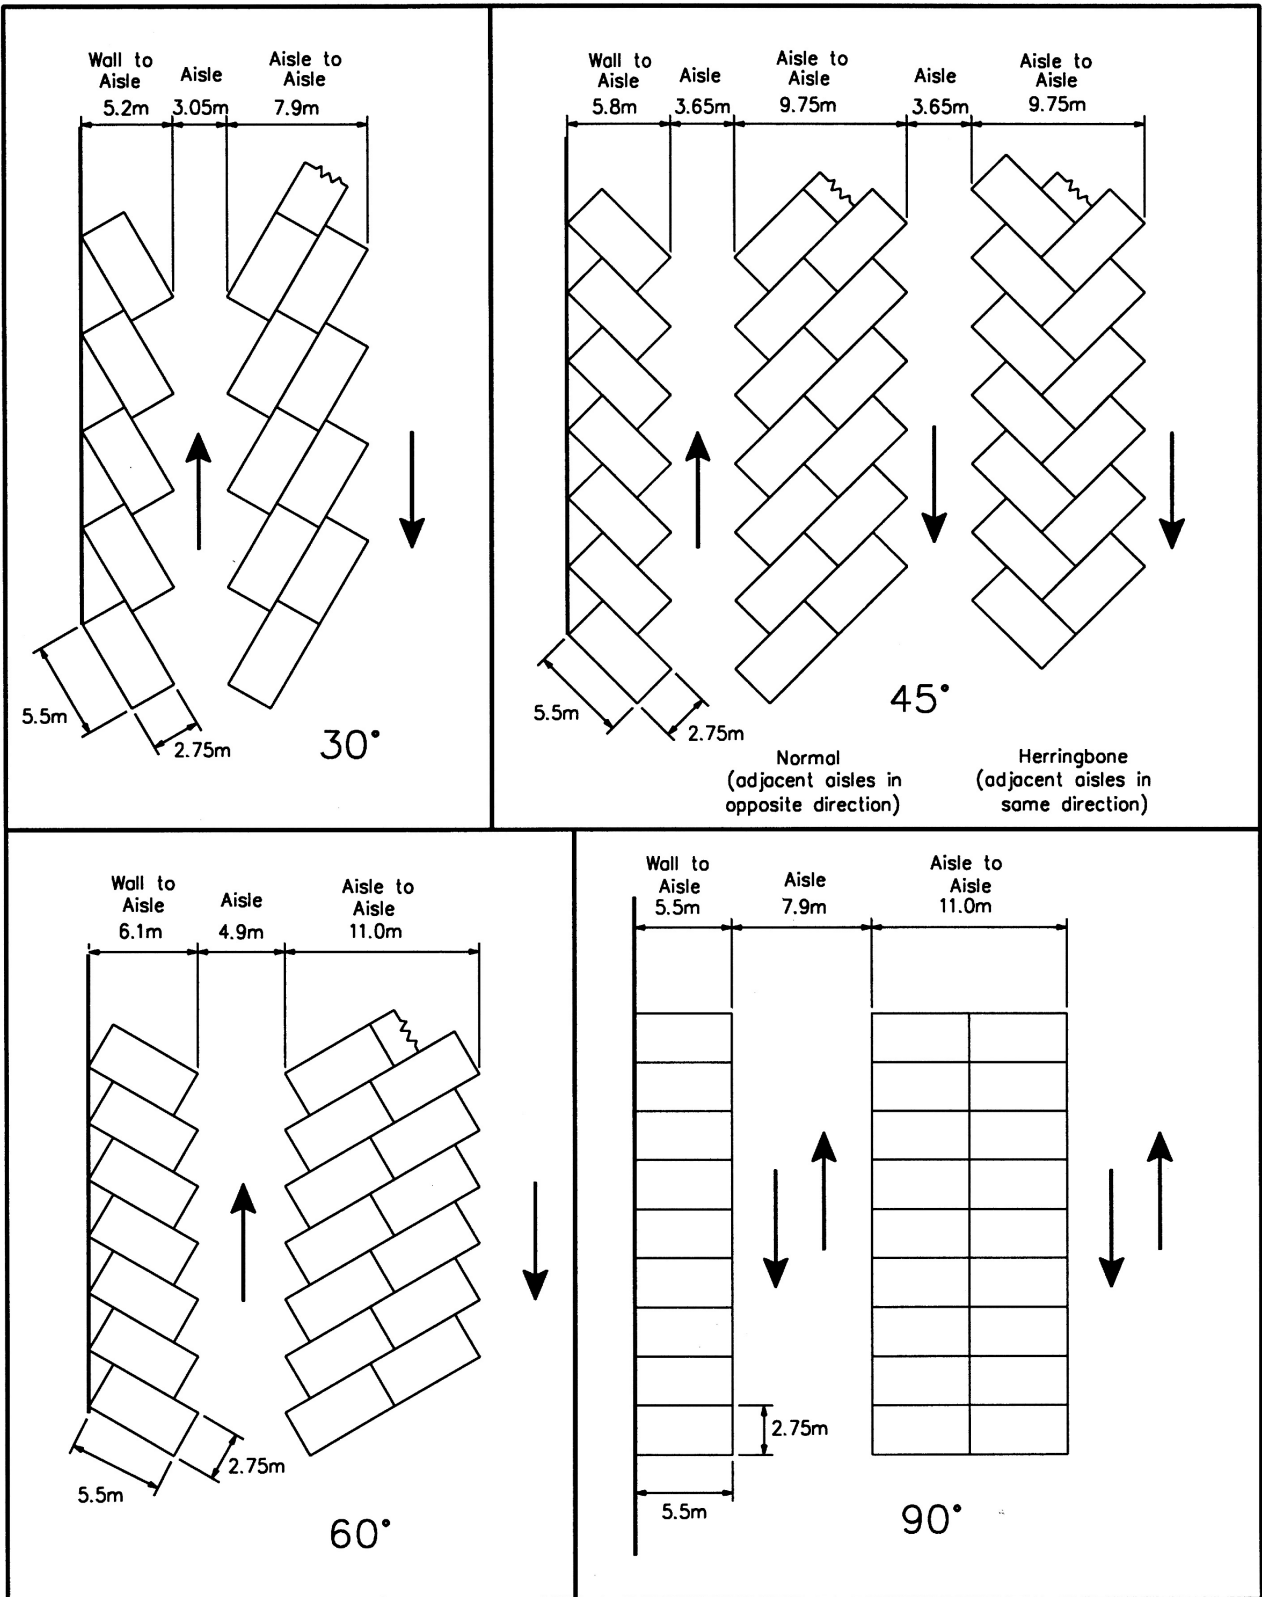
Aisle and Stall Dimensions for Various Parking Angles
